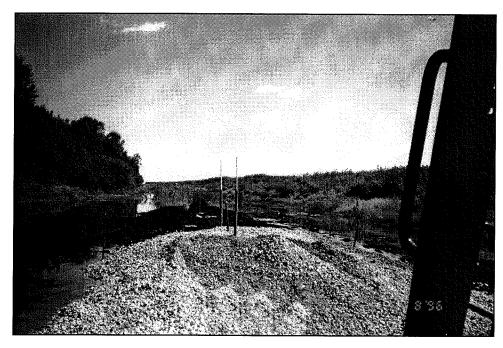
Typical site conditions at the trial ballasting site. Note the geotextile in the background used as a separation layer between the original backfill soils and the granular ballast.
